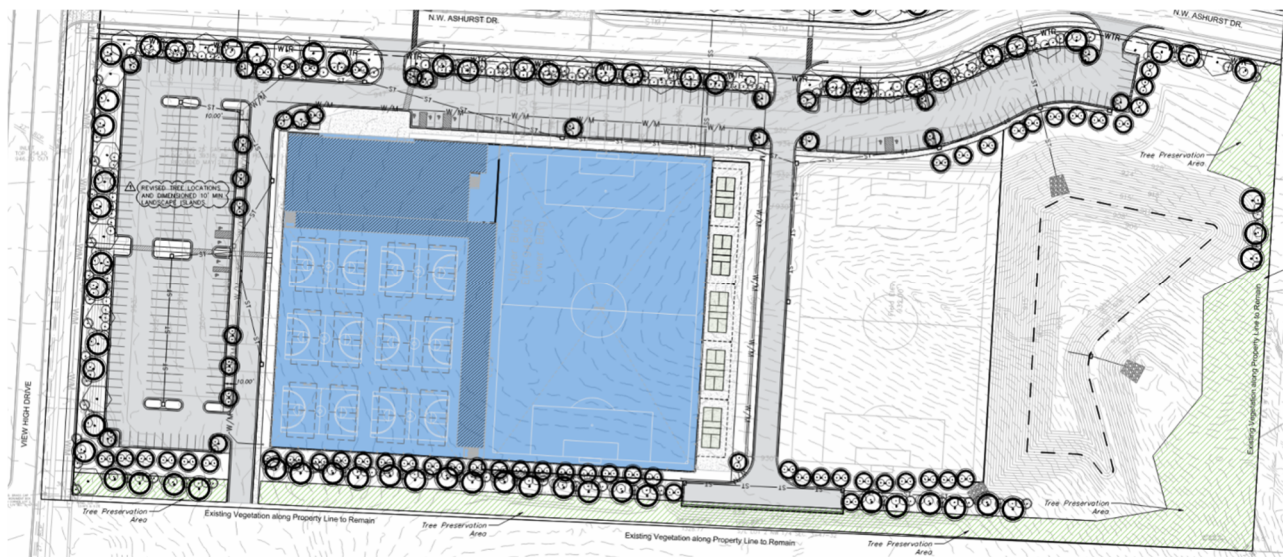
Proposed landscape plan (green hatched area denotes tree preservation in lieu of six-foot tall fence of three-foot tall berm)
